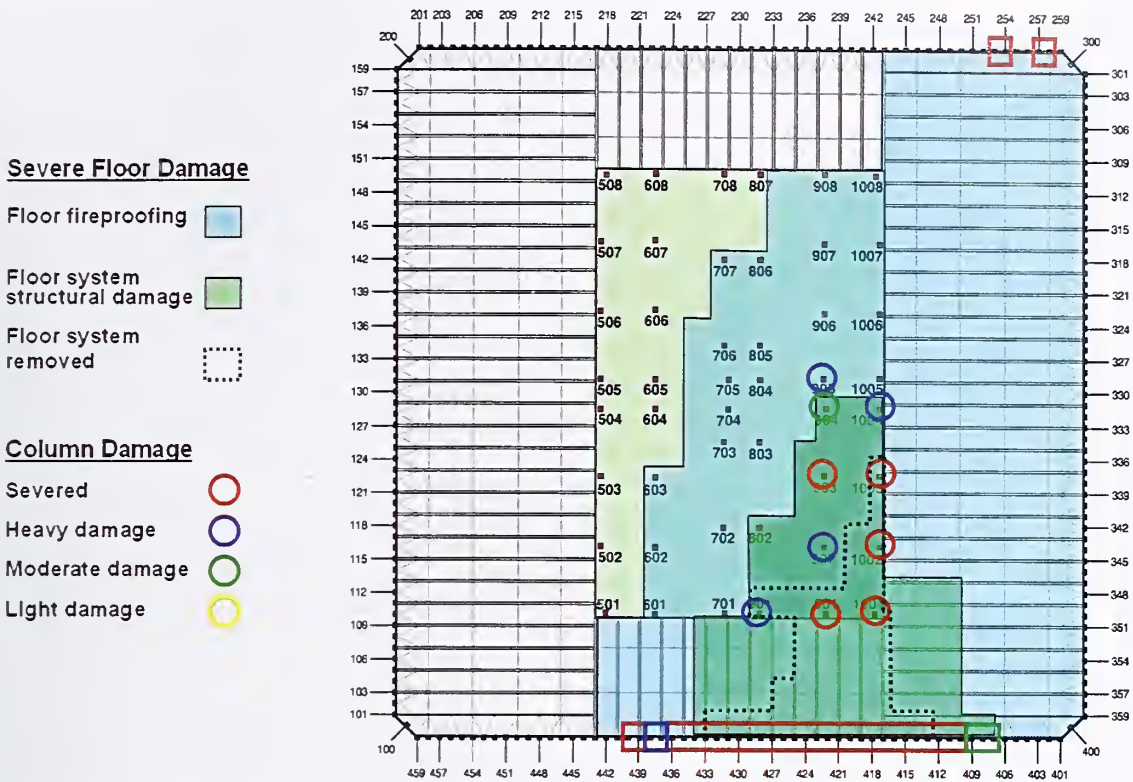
Combined structural damage to the floors and columns of WTC 2, Case C.
